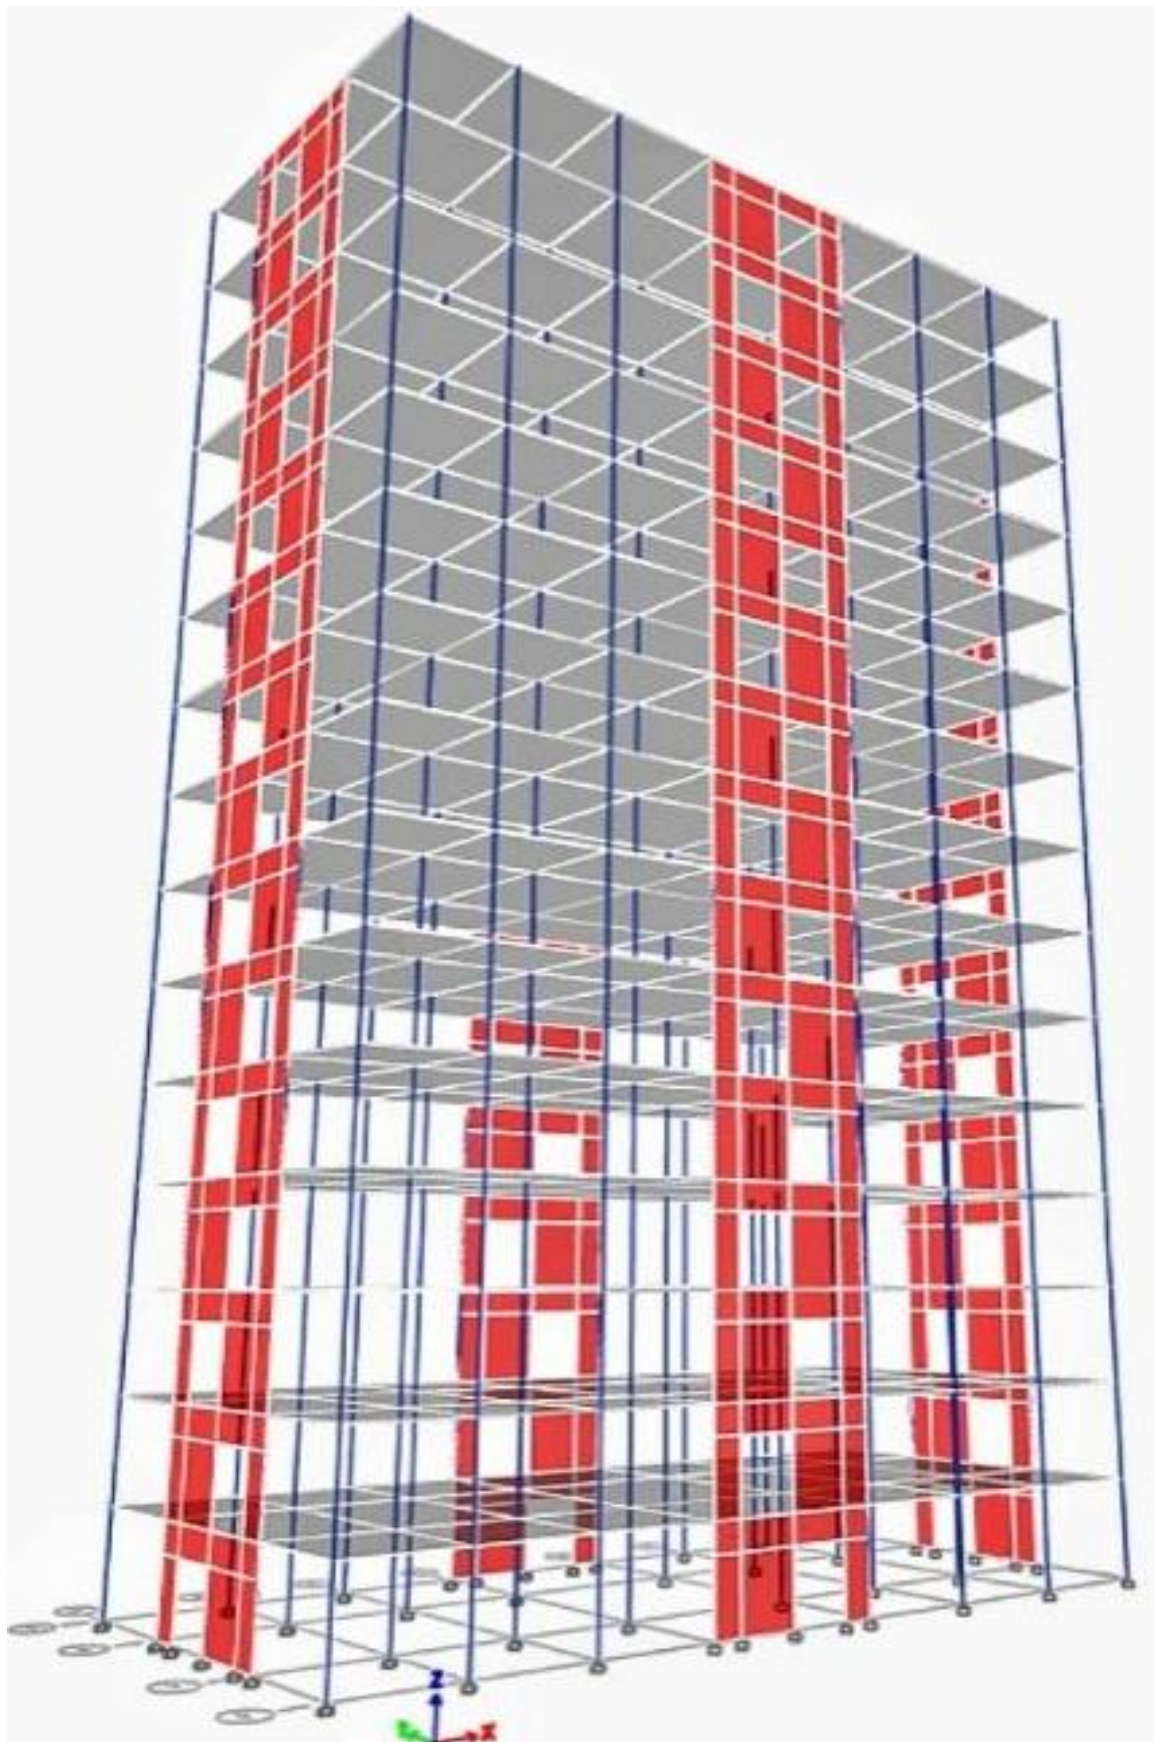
Model II – SMRF structure with staggered opening shear wall.
